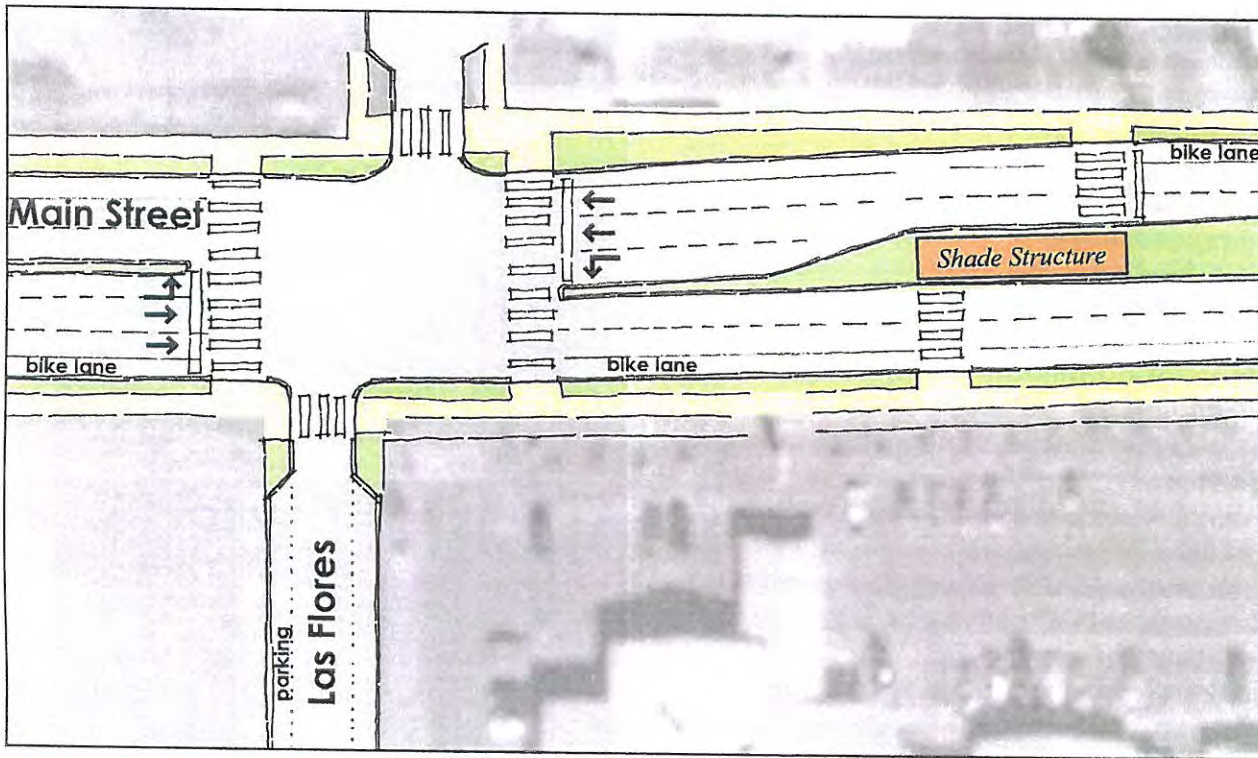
Short-term recommendation for Las Flores Drive intersection.
